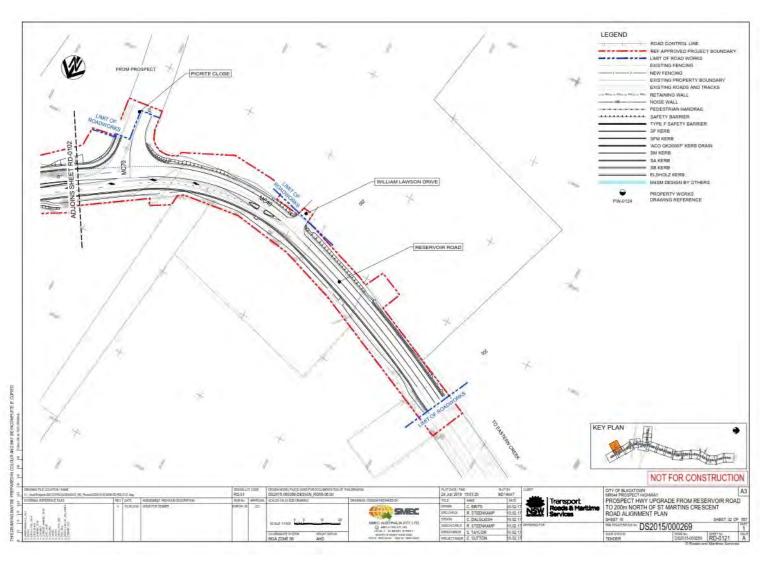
Proposed road alignment along Reservoir Road (SMEC Australia, DS 2015/ 000269 24/06/2019Road alignment plan, Sheet No. RD-0121)
